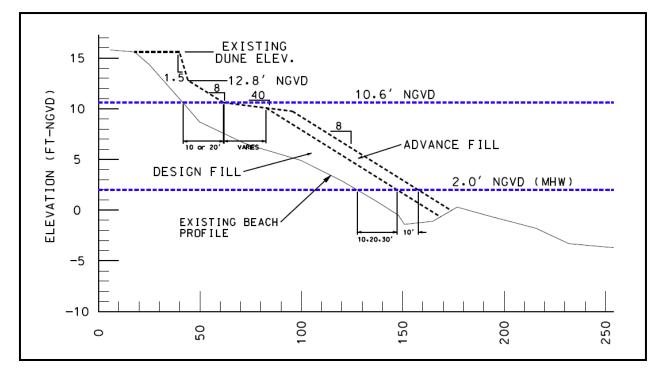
Brevard County Mid-Reach LPP Plan (GRR Recommended Plan with Beachfill Profile and Mitigation Site Shown)
